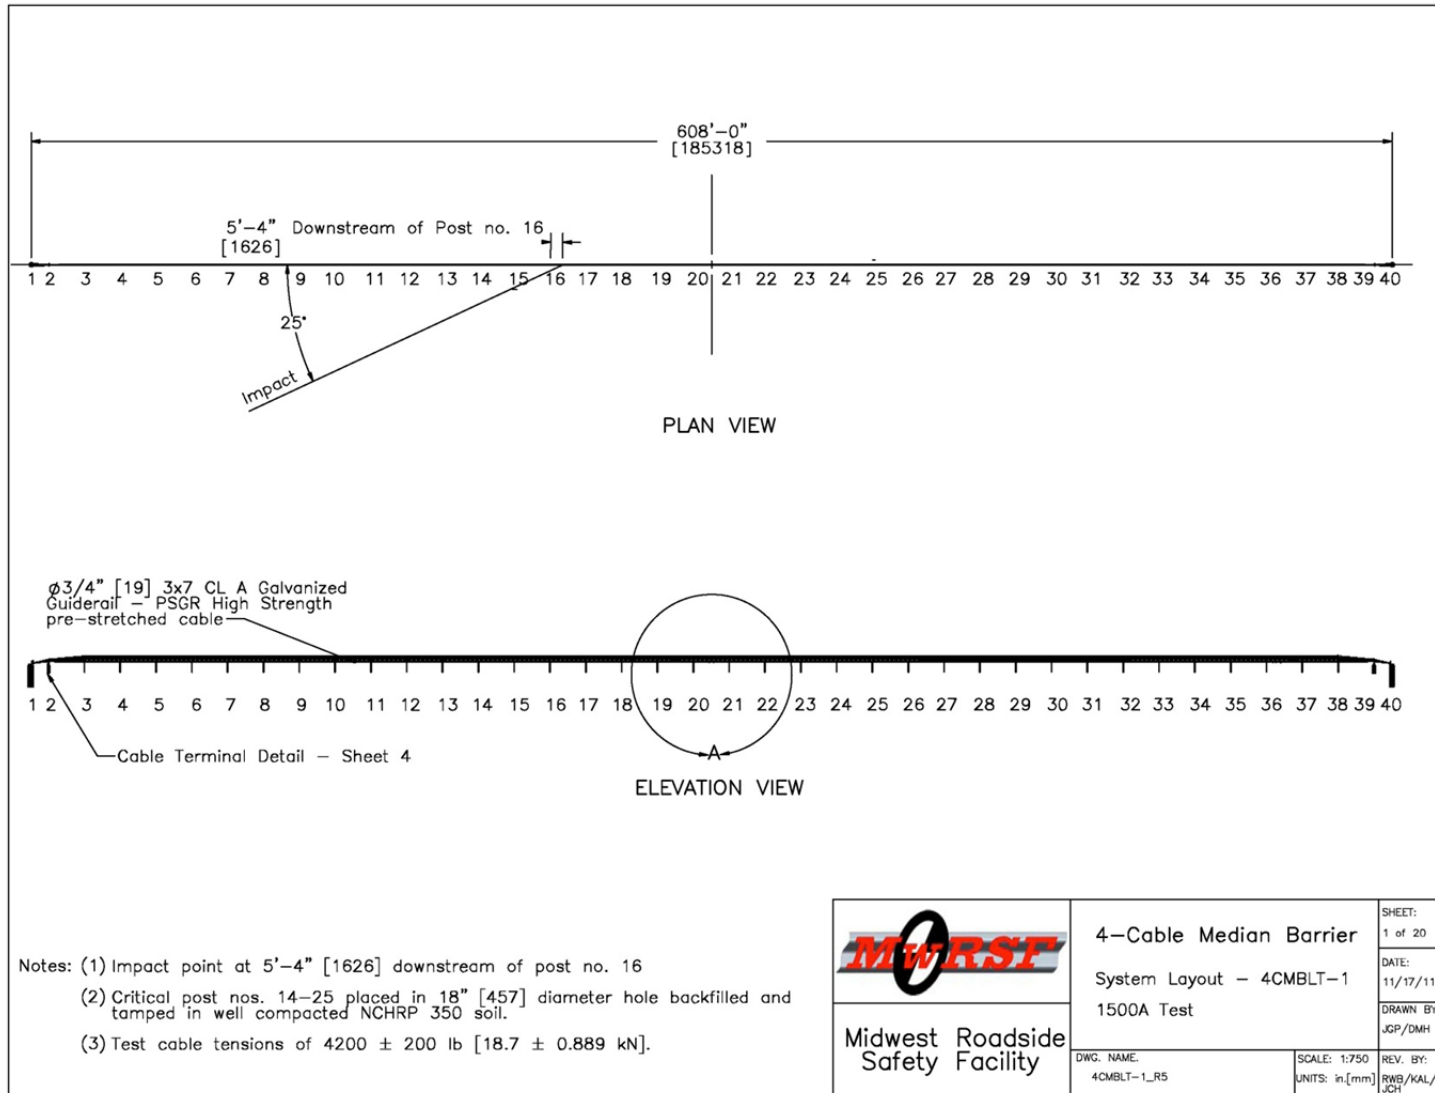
Test Installation Layout, Test No. 4CMBLT-1
